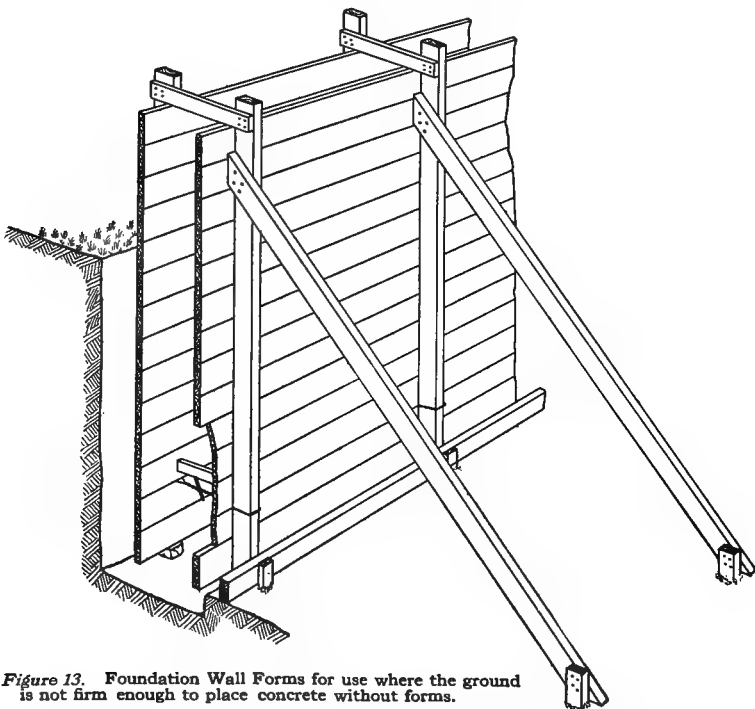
Foundation Wall Forms for use where the ground is not firm enough to place concrete without forms.
